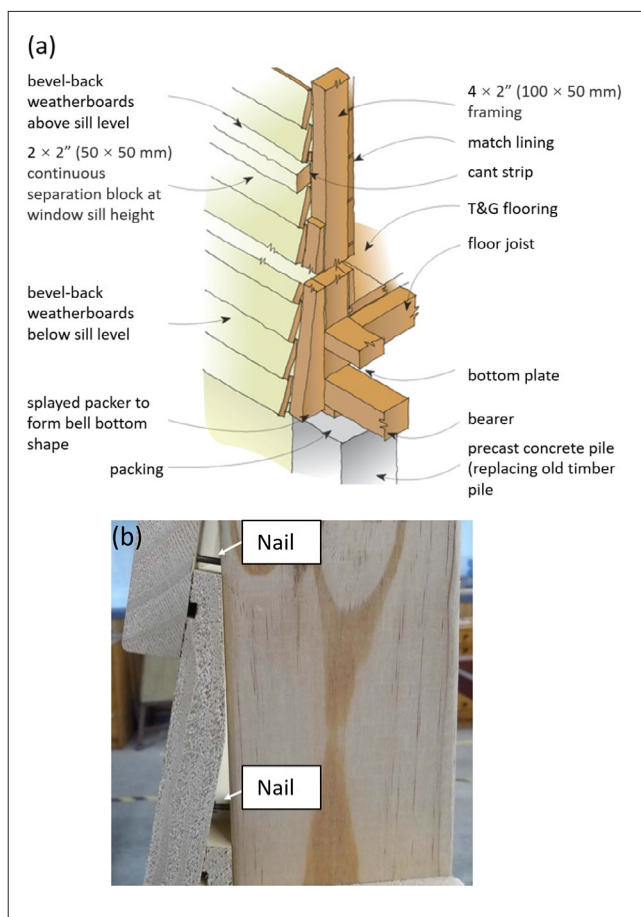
Bell-cast horizontal weatherboard: (a) overall construction [13]; (b) nails detail [9].
